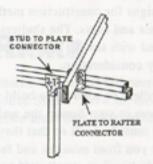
Connect the rafters to the top plate and connect the top plate to the wall study using the proper connectors.
